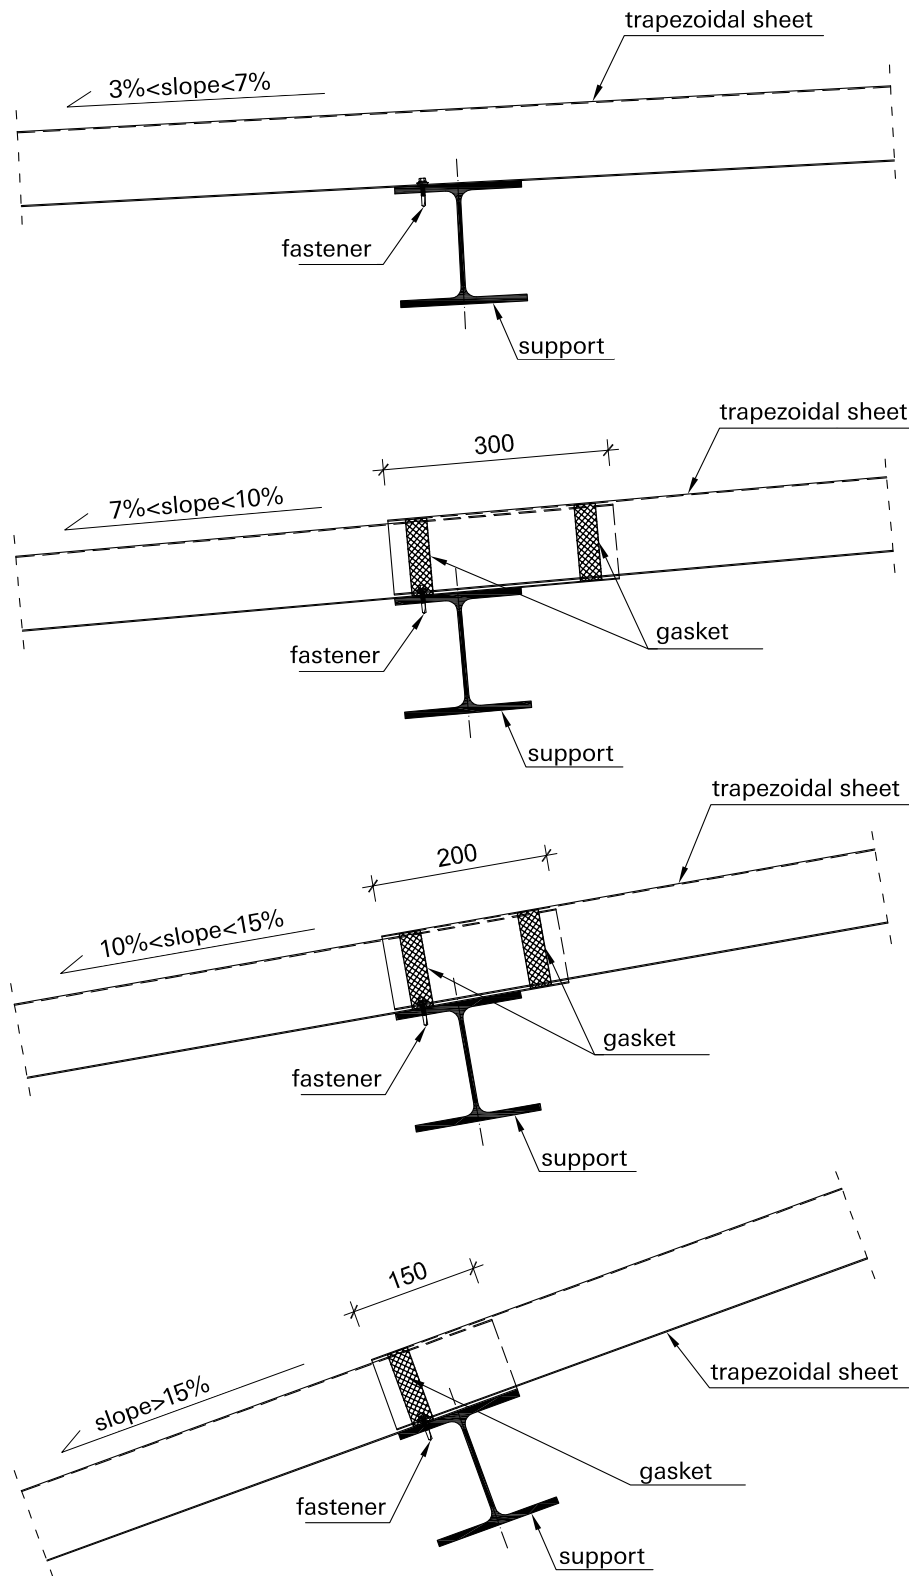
Example of the size of an overlap between the sheets on an insulated roof - sheet installation method with a connection over the intermediate support.
